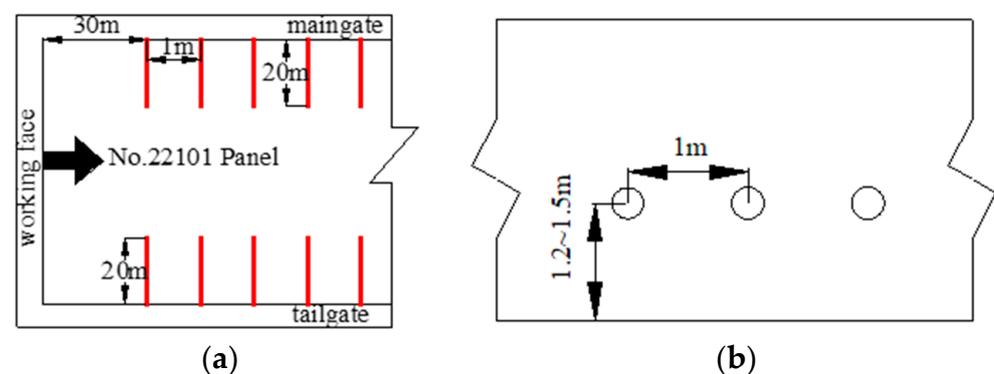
Plan and section of the pressure relief borehole in panel preparation stage of No.22101 Panel. (a) Plan. (b) Section.
